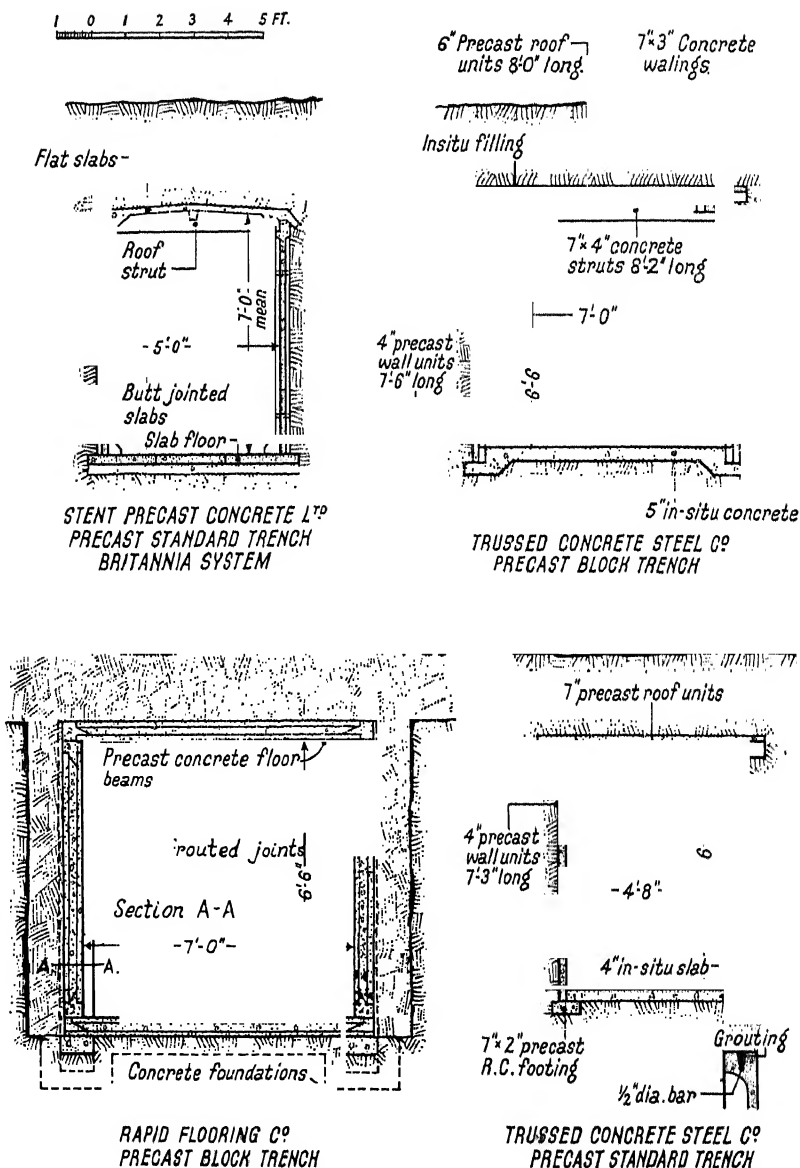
Approved trench lining systems in pre-cast reinforced concrete.
